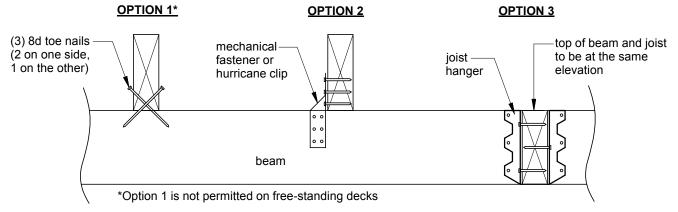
JOIST-TO-BEAM CONNECTION DETAILS
